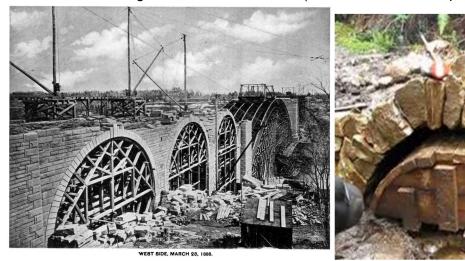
(Left) Washington Bridge west side 1888 and (Right) A small arch model bridge made by a person by putting stones together by hand [28]
